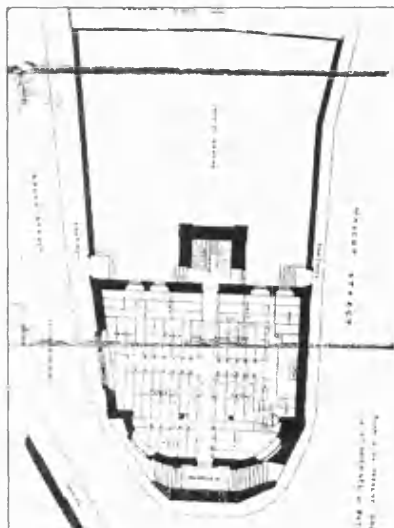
John Harvey's church, 1734. The upper half of this Ground Floor plan shows the former graveyard incorporated in Mannes's site.
